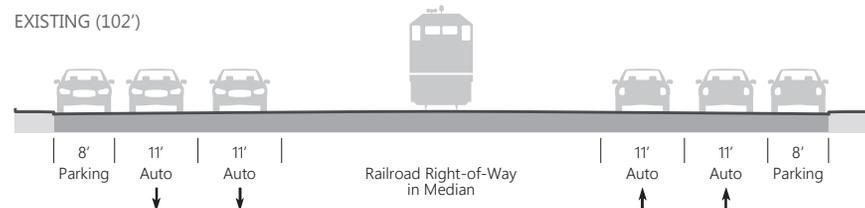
RANDOLPH STREET EXISTING CROSS-SECTION
